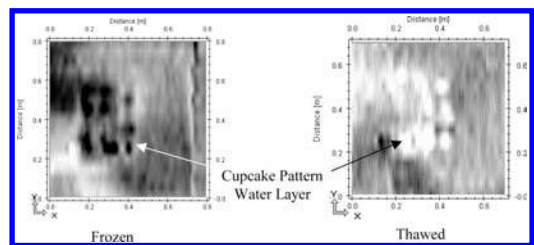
Ground penetrating radar measurements with 2.3 GHz handheld antenna on concrete slab specimen with frozen and thawed cupcake pattern water layer.
